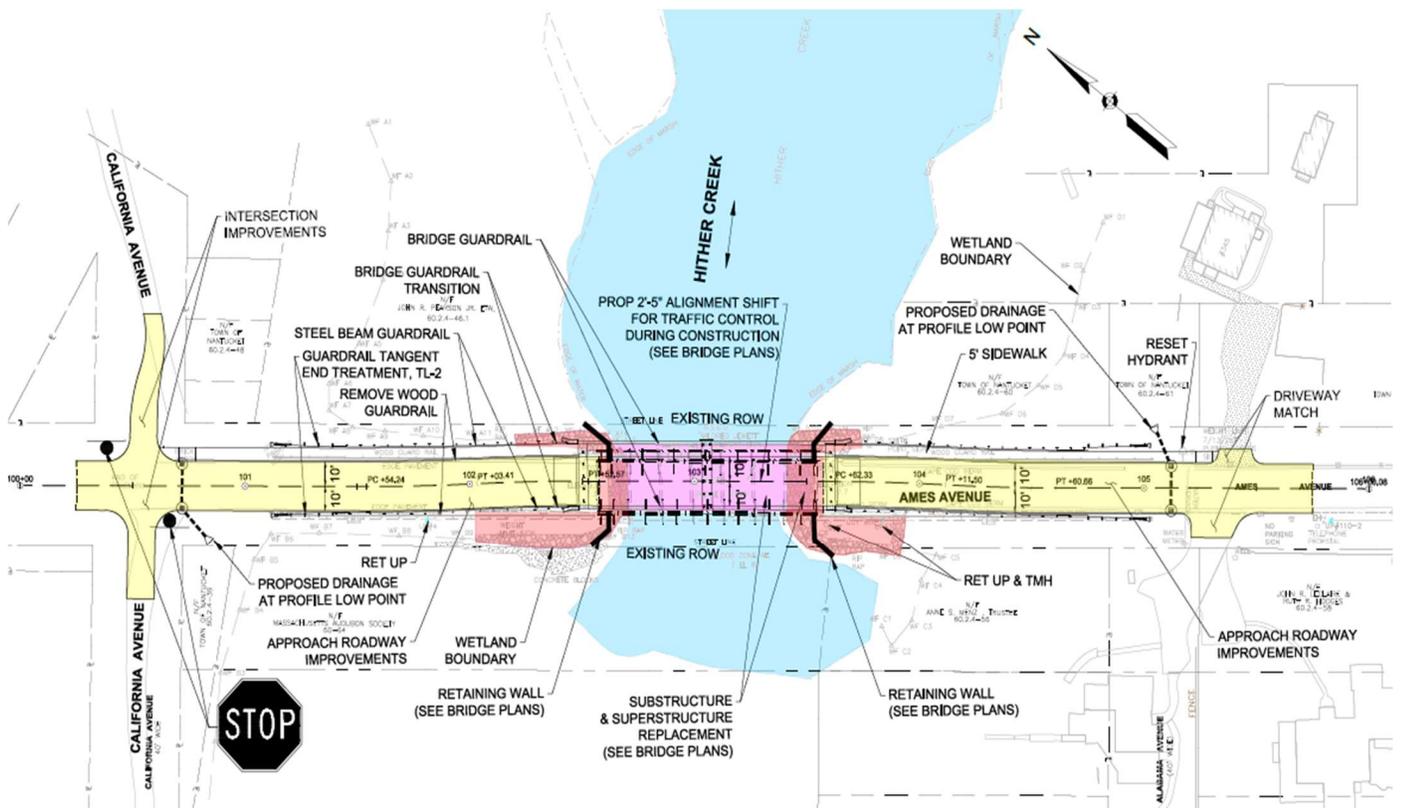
Replacement Alternative for Ames Avenue Bridge - Option 2
